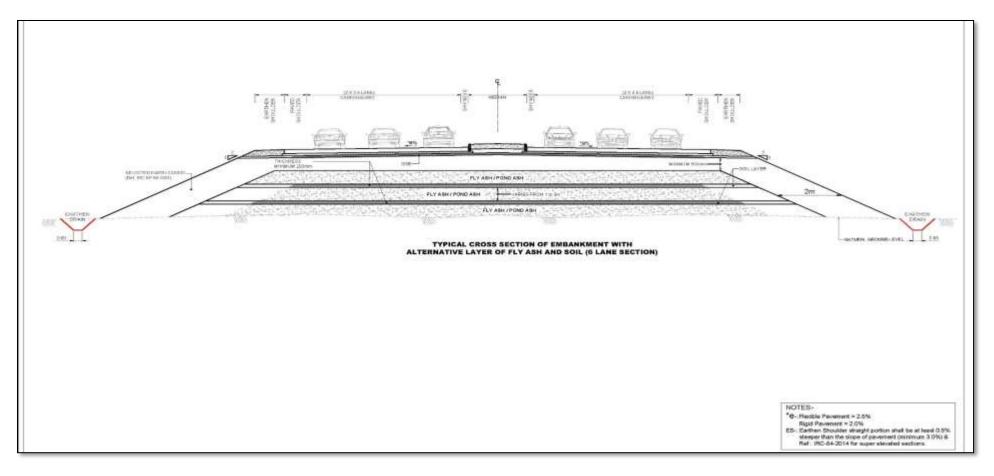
Typical Cross Section of Embankment with Fly ash
